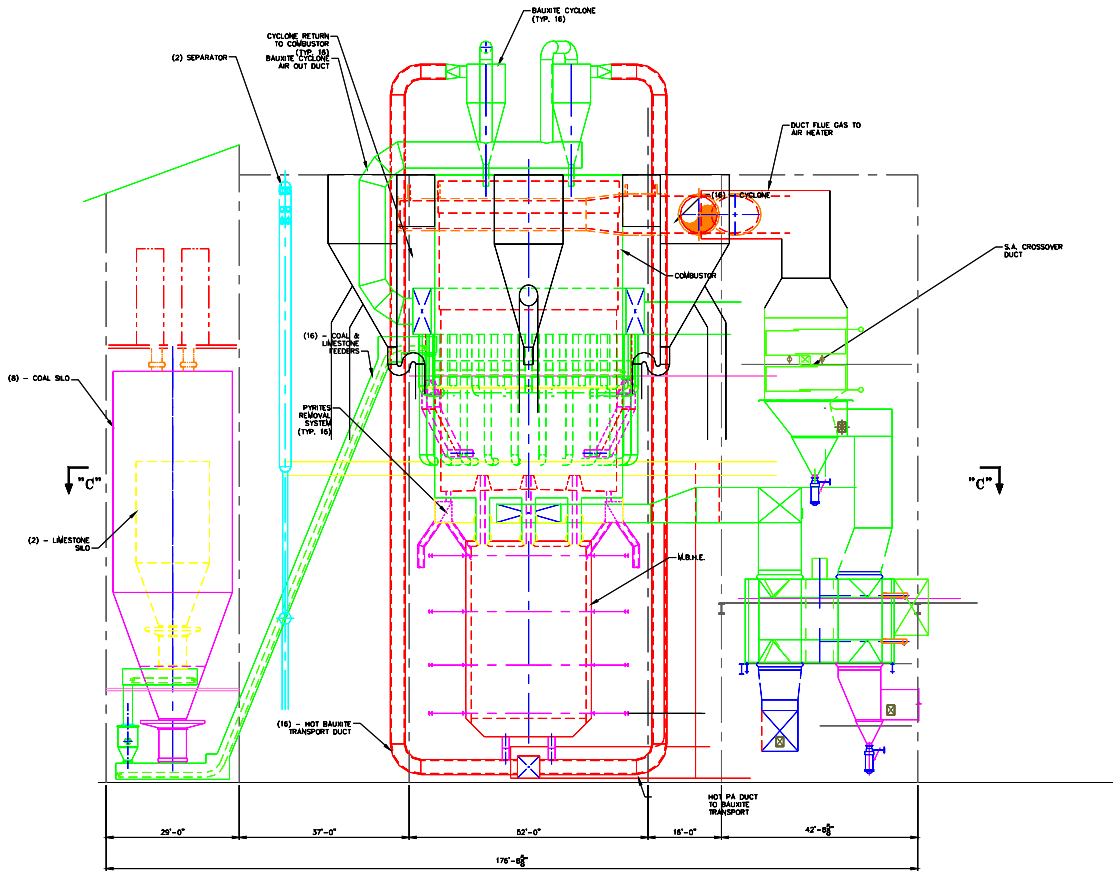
4: CMB™ Combustor General Arrangement Drawing (Side Elevation)
